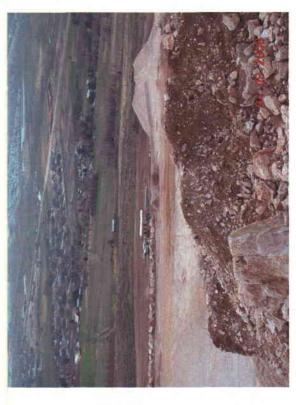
Near the center of the photo is a scale house on a different level than the pad. To the right of the scale house is a large pile of gravel and smaller-sized material.
